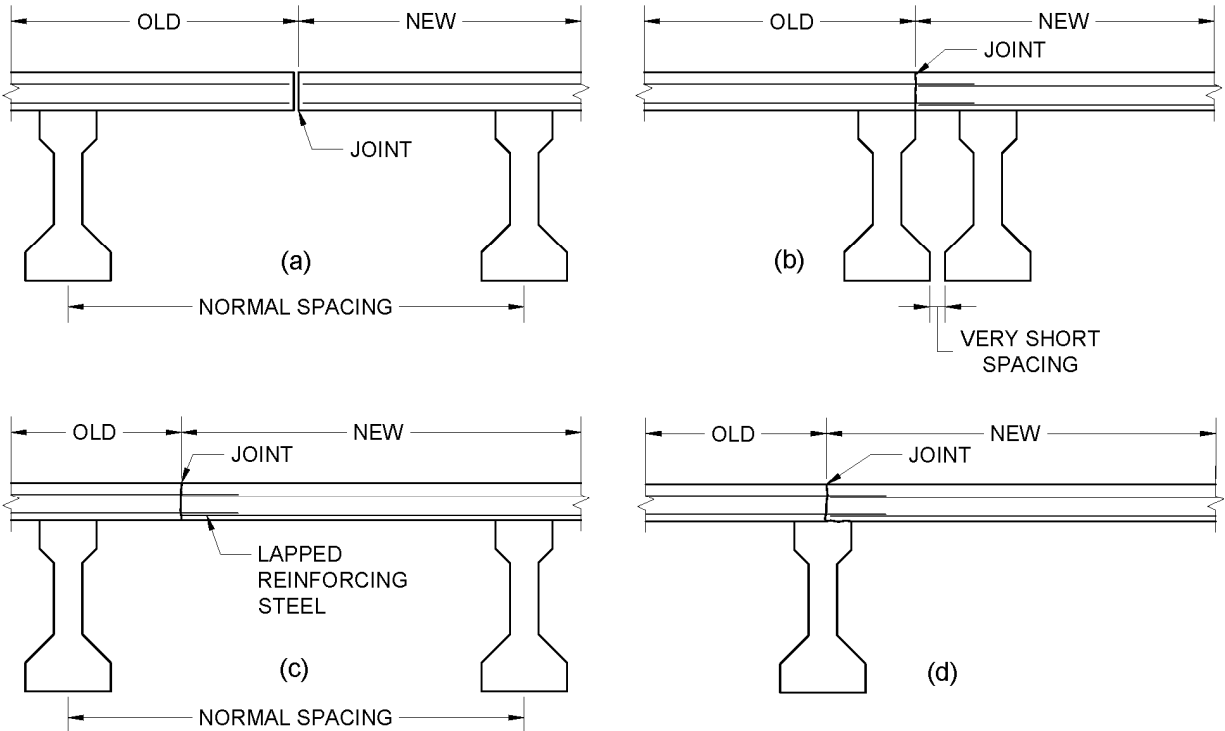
Longitudinal construction joint details encountered in Furr and Fouad (1981)
